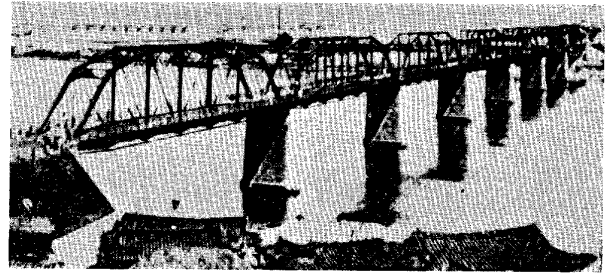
Bridge over Han-gang at Kyongsong. Old truss bridge with narrow roadway and walks.
